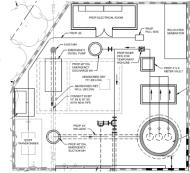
Plan view of proposed new lift station adjacent to existing.
